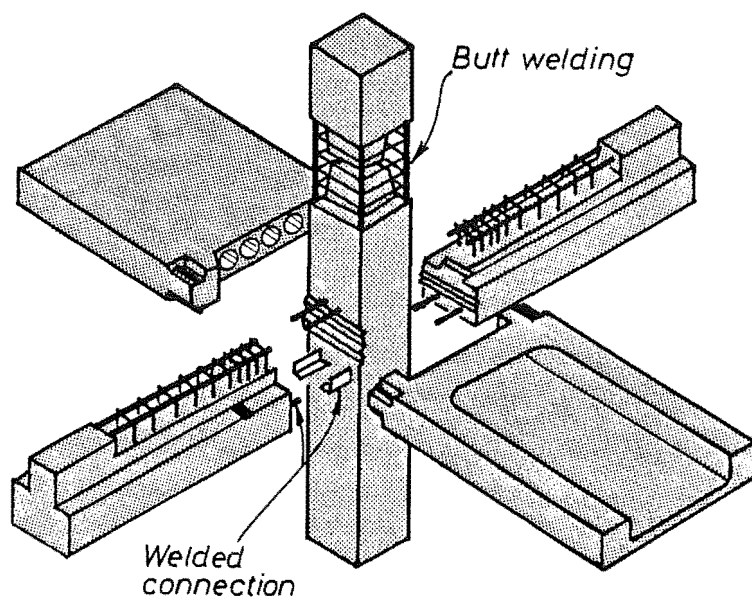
Typical Arrangement of Precast Concrete Framed Construction Used in the U.S.S.R. [Bychenkov (1978)].
